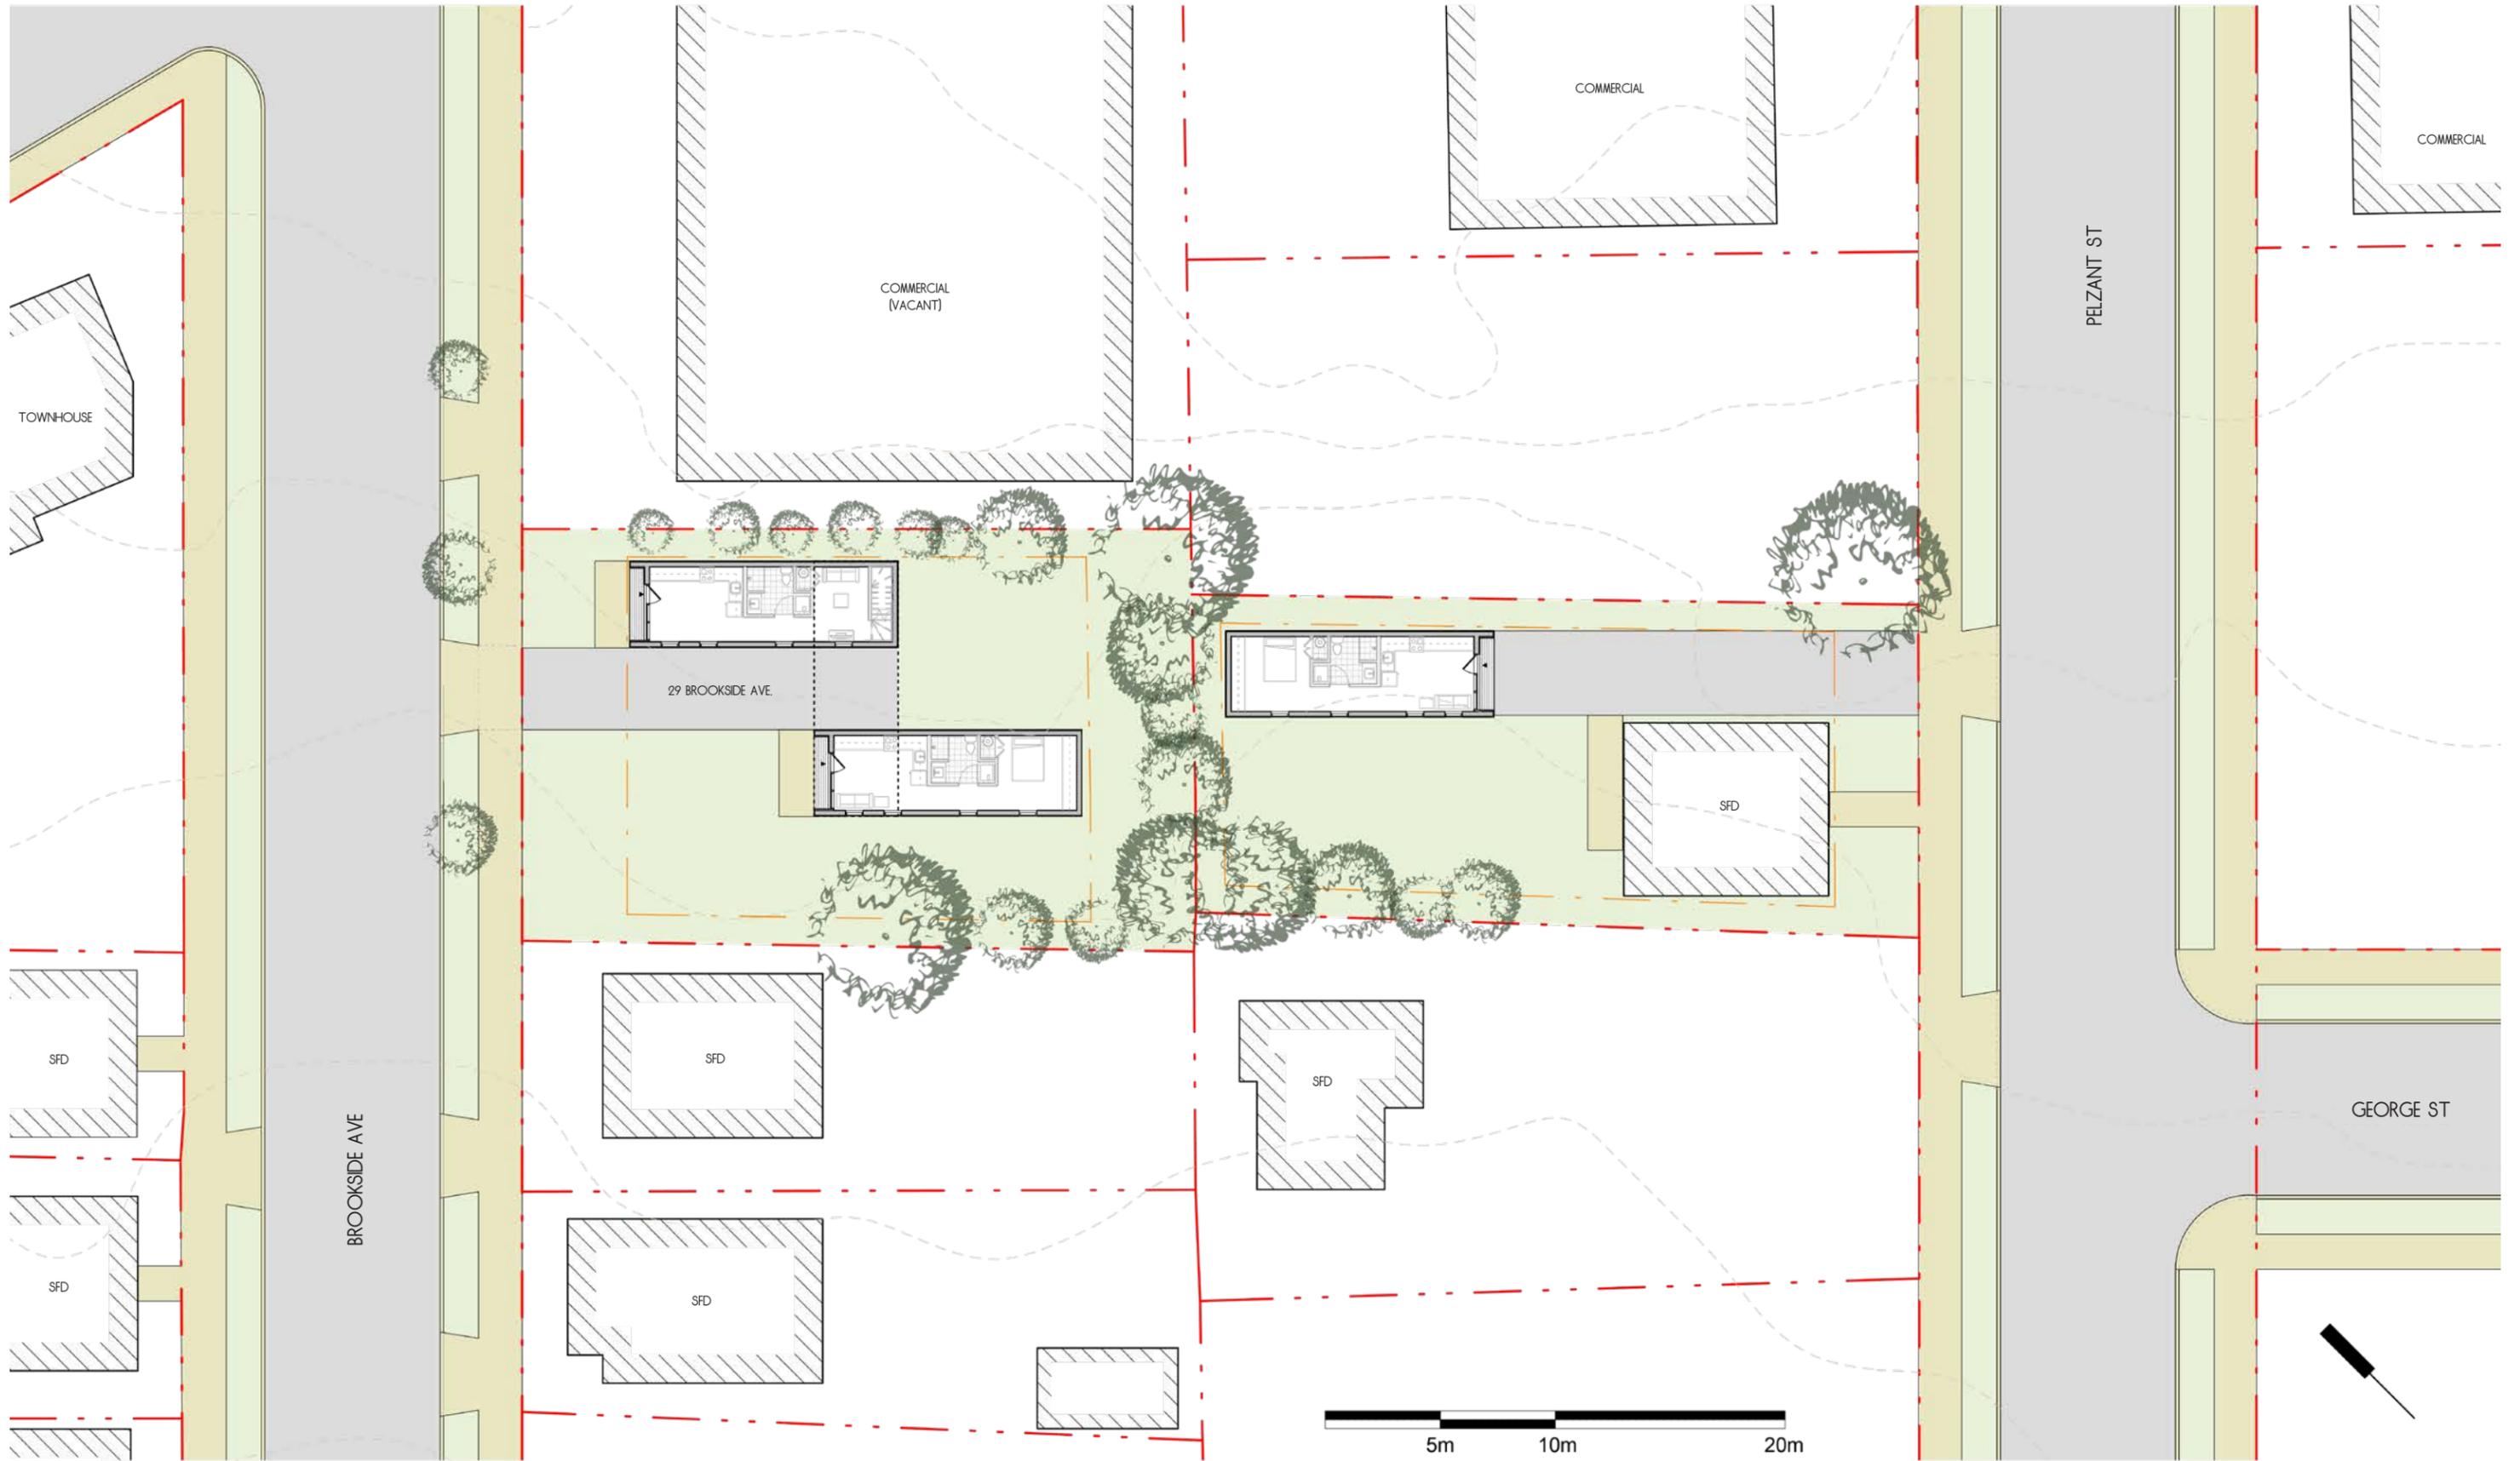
SITE PLAN: 29 BROOKSIDE + LANEWAY
